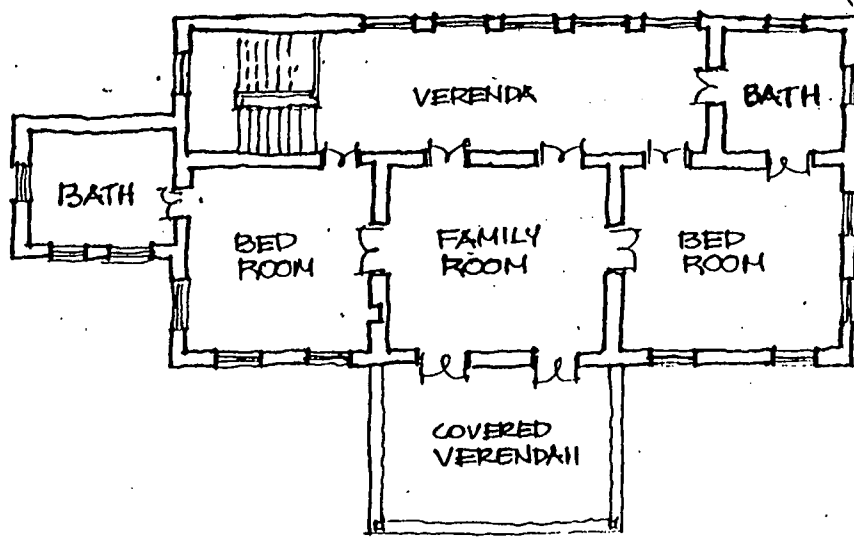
First floor plan, bungalow of S.P. Dinajpur
